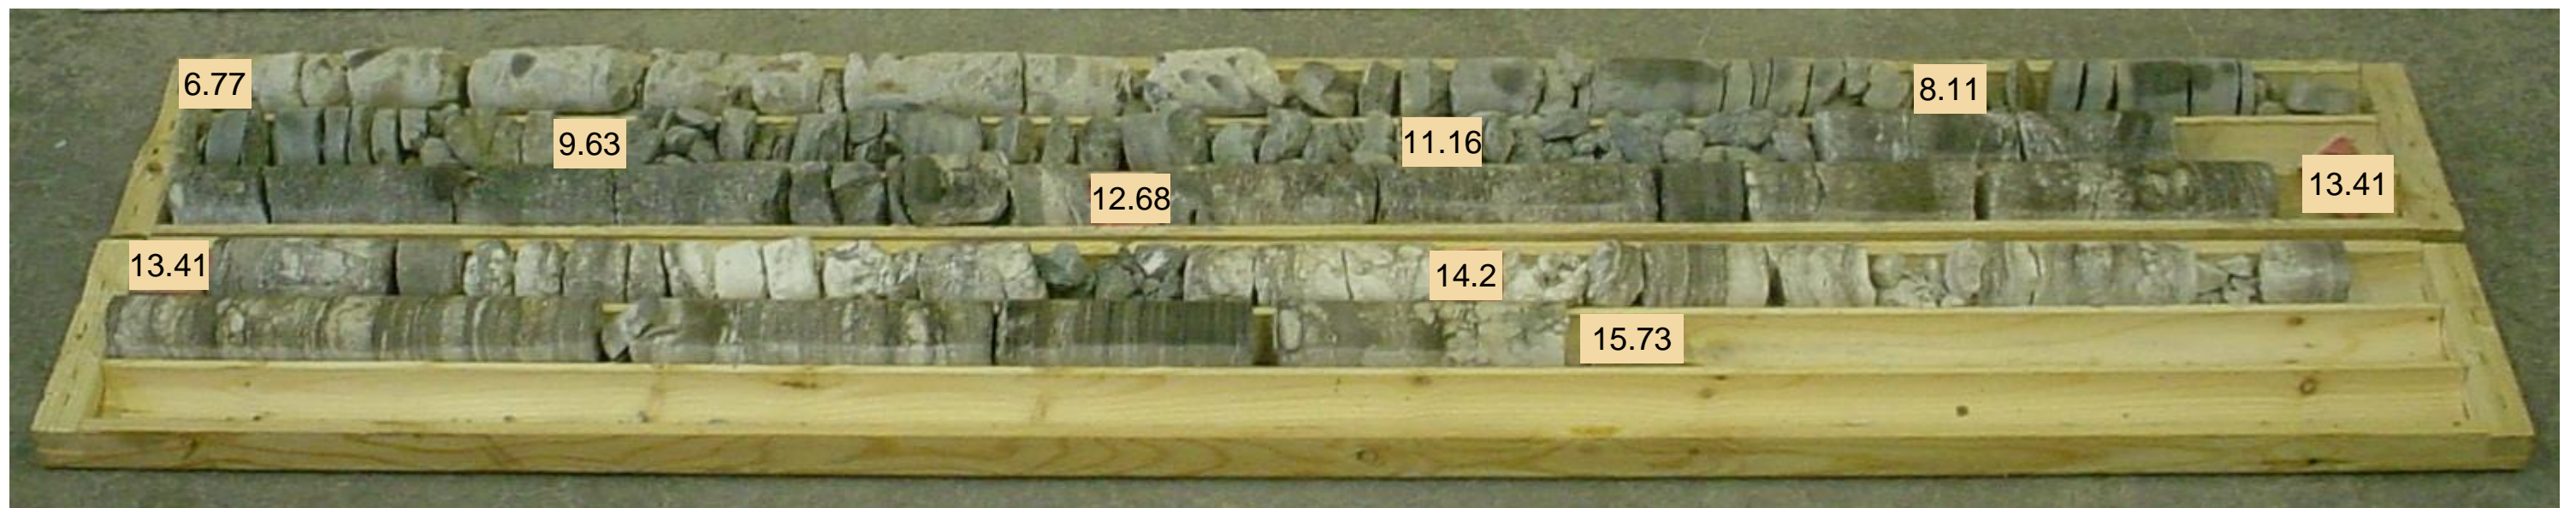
Borehole No. 102 – Rock Core. Concrete to approximate elevation 184.0 metres. Elevation 184.63 metres to 175.67 metres.
